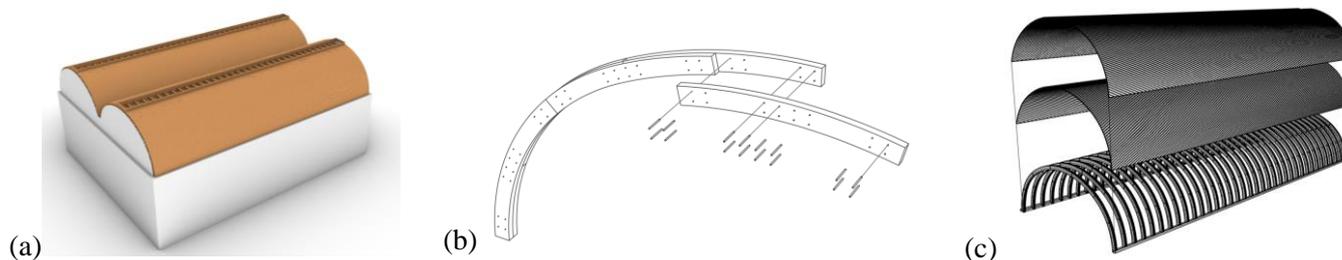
a) Building (vat-room); b) Layers of the roof structure: arcs – first layer of battens – second layer of battens; c) overlapping arc elements
